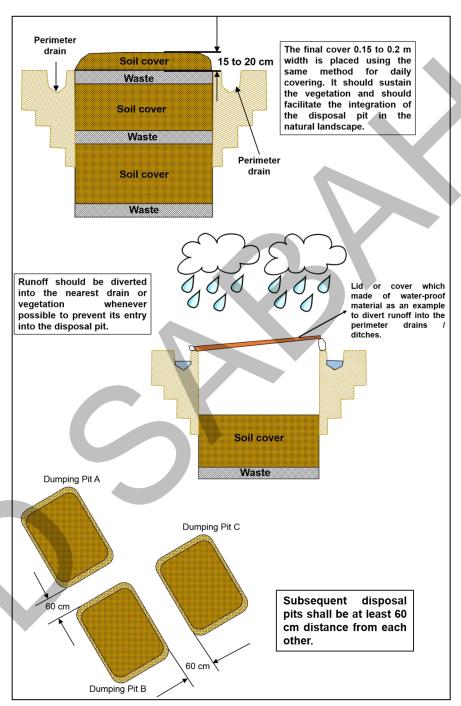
Example of open trench method for disposal of solid waste on site.
